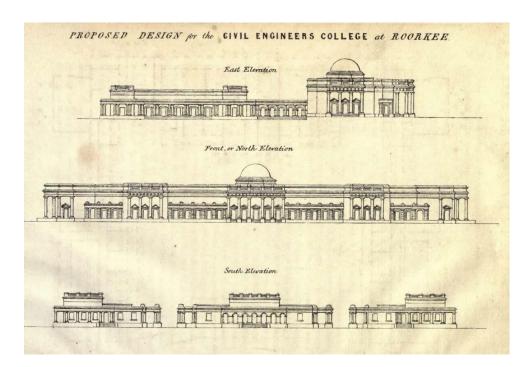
Proposed design of the new buildings of Roorkee College for Engineers
